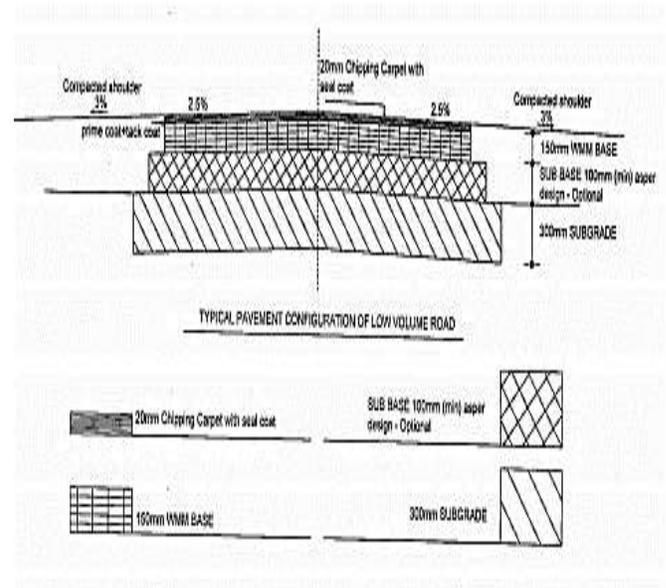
Typical Pavement Configuration of Low Volume Roads (source IRC SP 72-2015)
